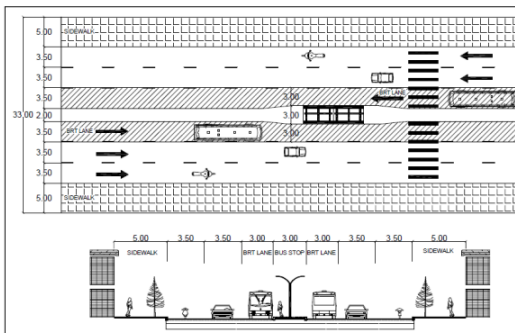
Cross section design on Nguyen Luong Bang – Ton Duc Thang street ($B < 38m$) [8]
